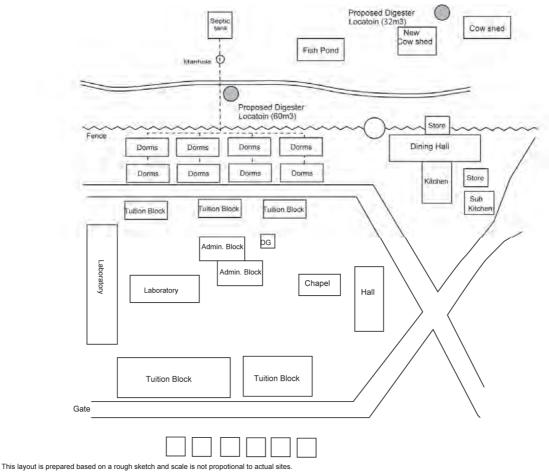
Example of Facility Sketch with proposed Digester Location
